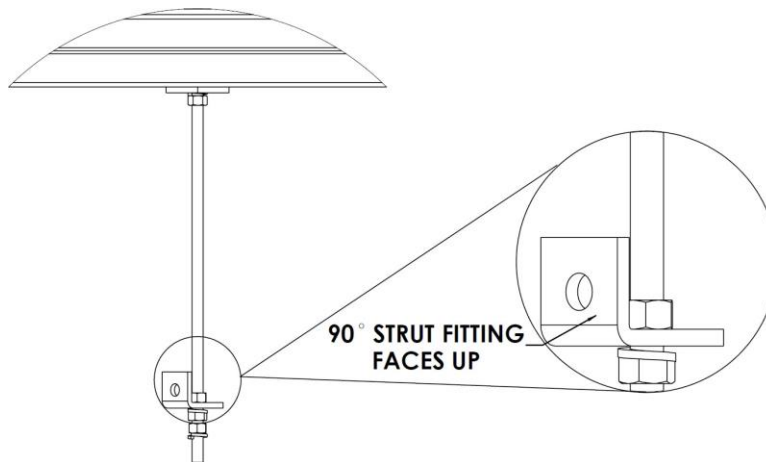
Two-hole 90° Strut Fitting Faces Upwards
